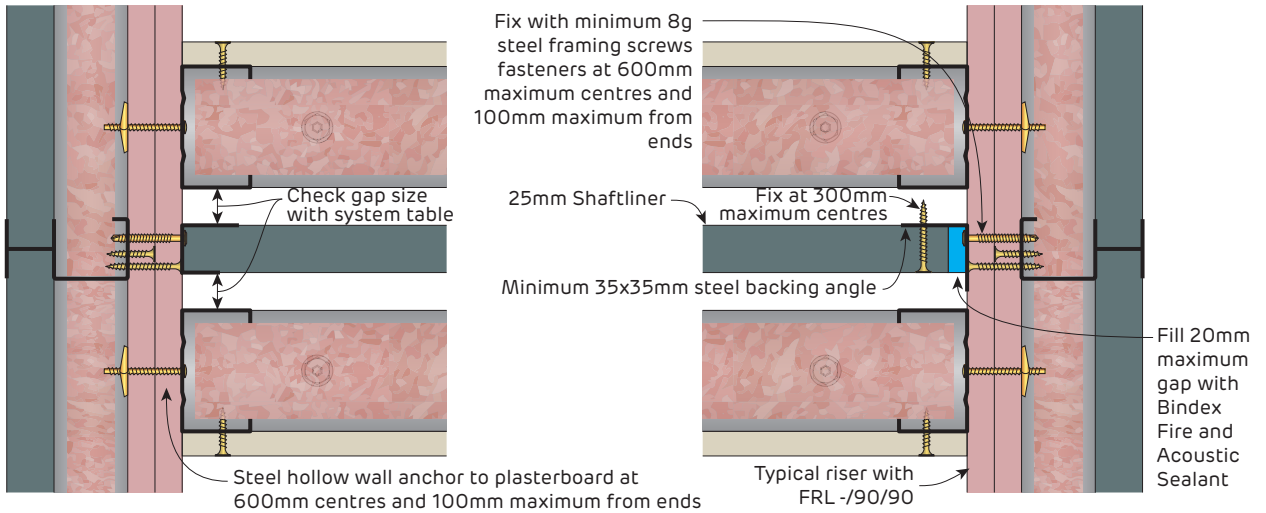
InterHome High-Rise Wall to Shaft Wall Plan
